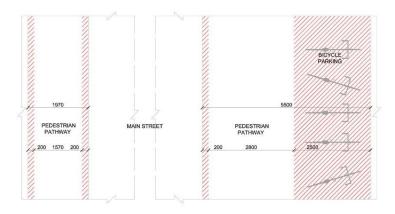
Street width and buffer spaces (in mm) for Gateway 8 in the area surrounding Offenbach am Main Hauptbahnhof
